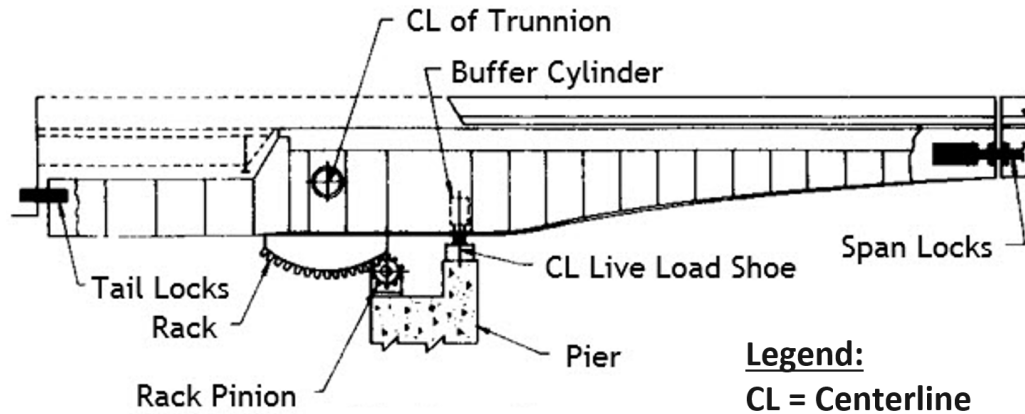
Trunnion Bascule Bridge Schematic
